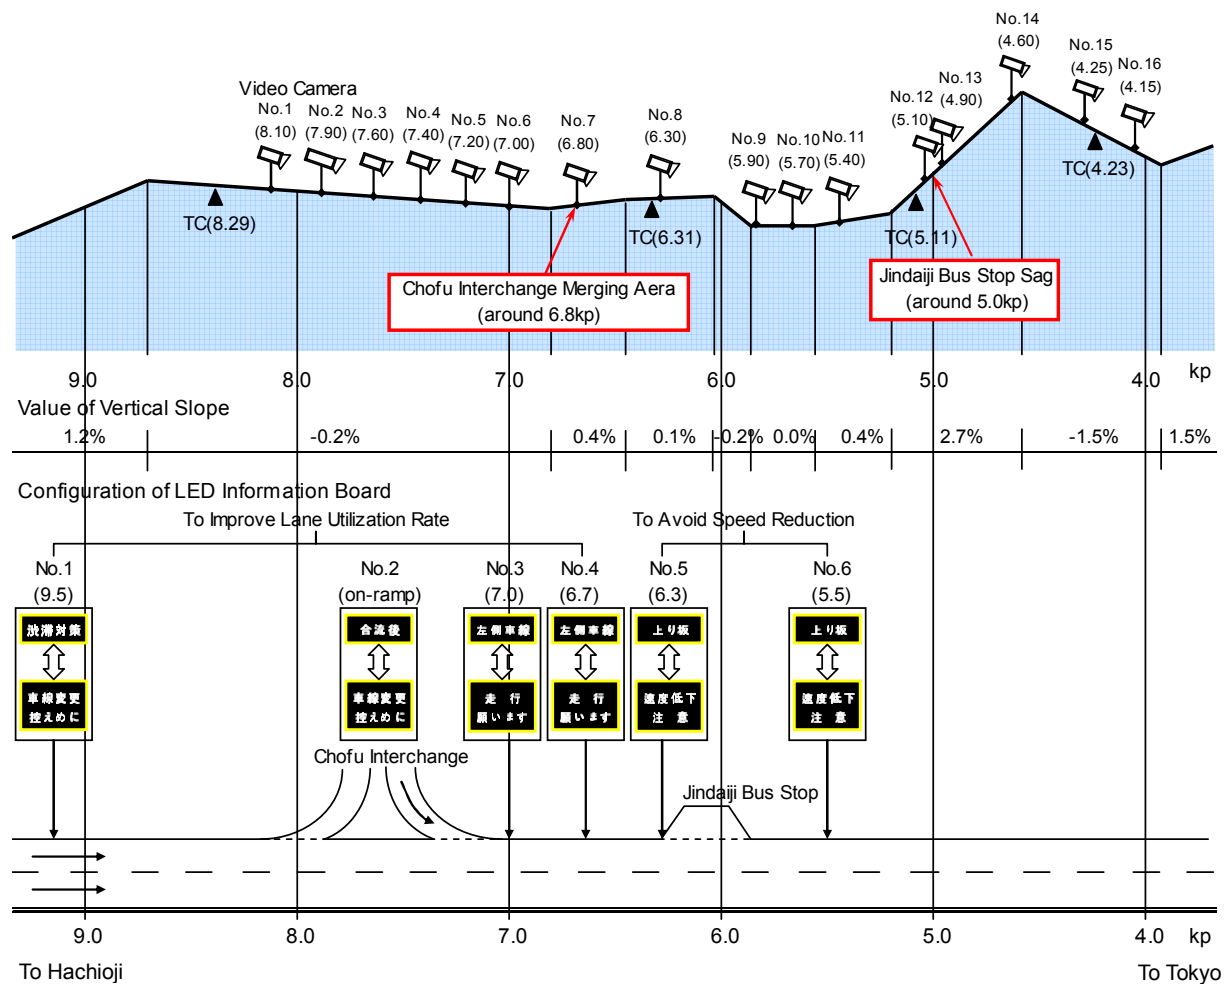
Vertical alignment, plan view, configuration of LED information boards
